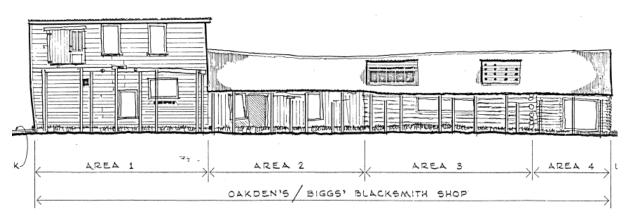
North elevation of structure. Note that "areas" signify a wooden structure – therefore, "Area 1" is referred to as the first structure; "Area 2", the second structure; "Area 3" the third structure; and "Area 4" as the fourth structure,
